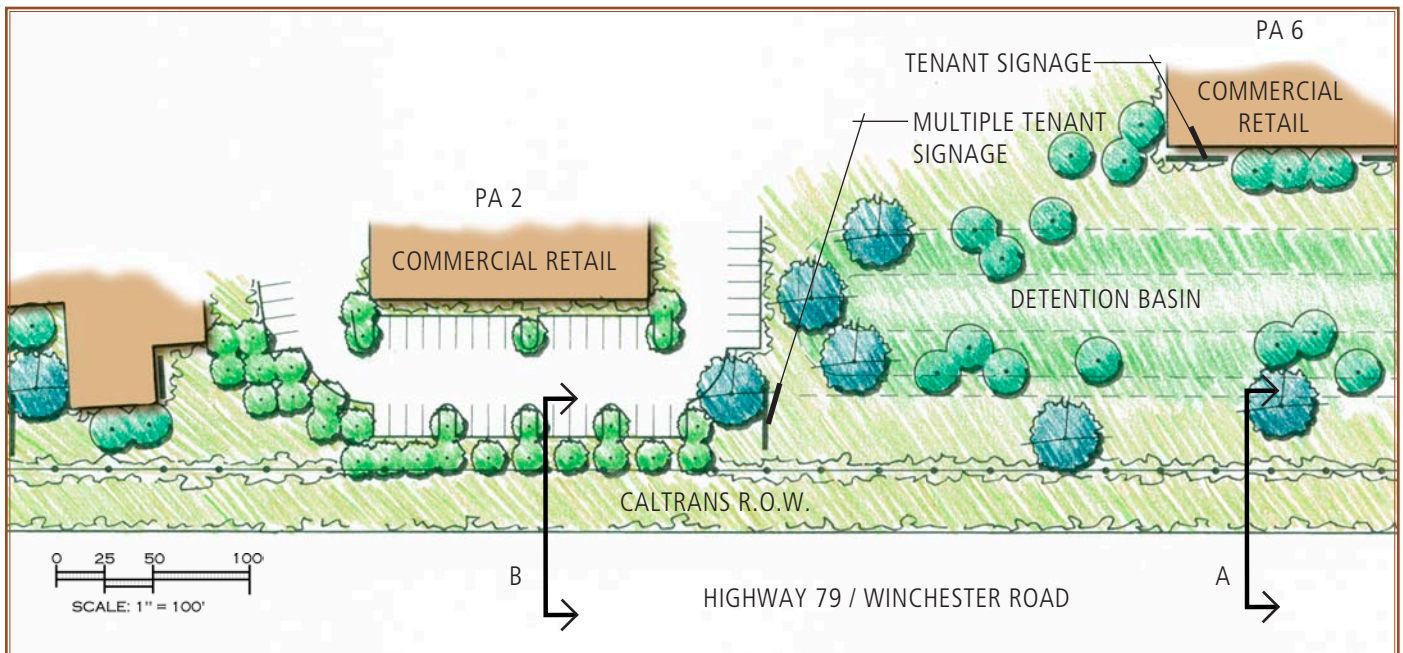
A: Commercial / Highway 79 Edge Treatment - Plan View
